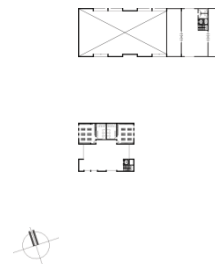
First Floor Plan of Exhibition Space and locker rooms (Source: Author)
